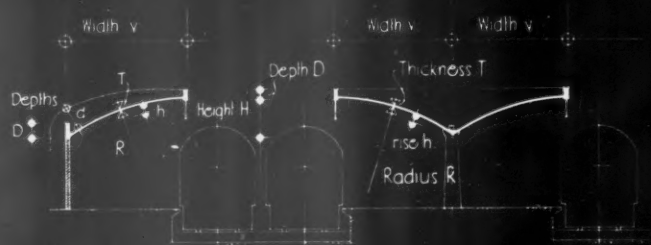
VAULTS & END FRAMES FOR RAILWAY PLATFORMS
